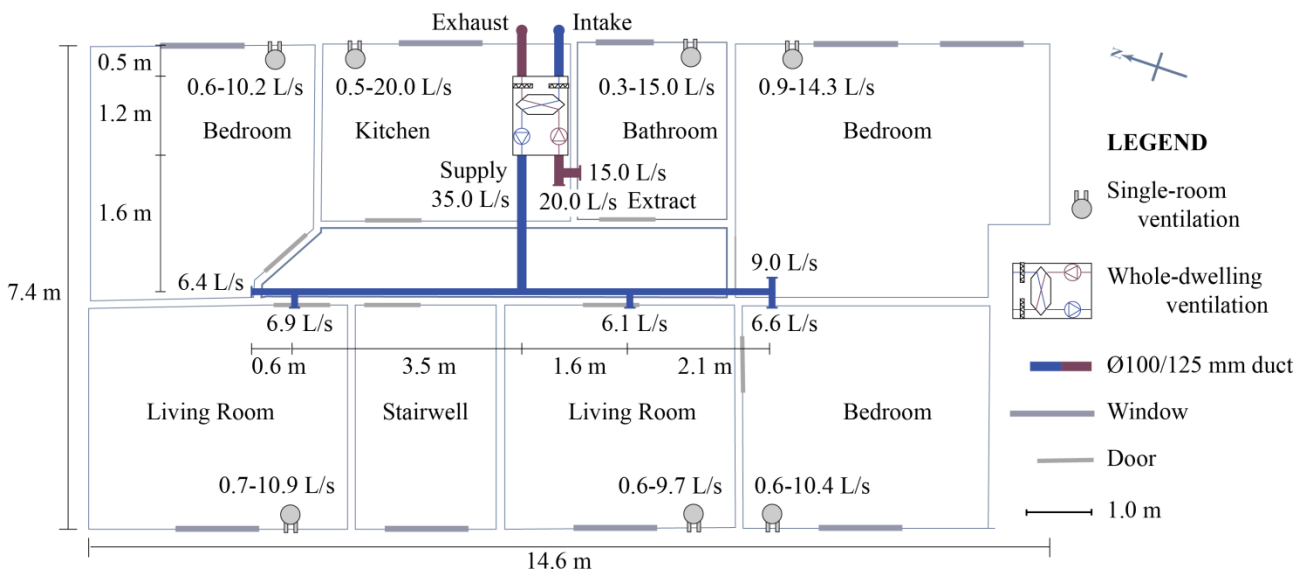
Floorplan of a renovated apartment with locations and airflows of the proposed ventilation systems.
